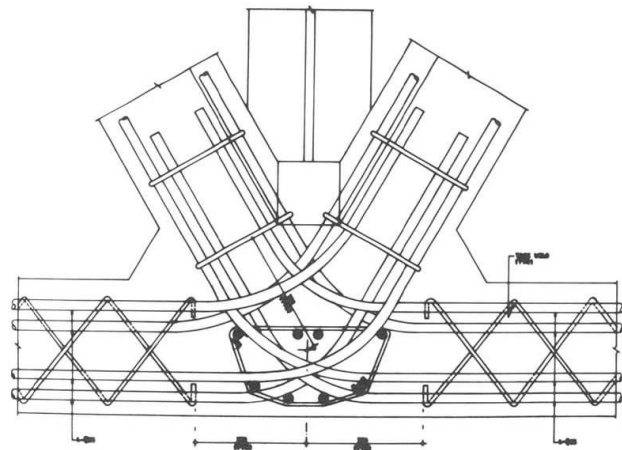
In-Situ Joint, Typical Reinforcement Detail
